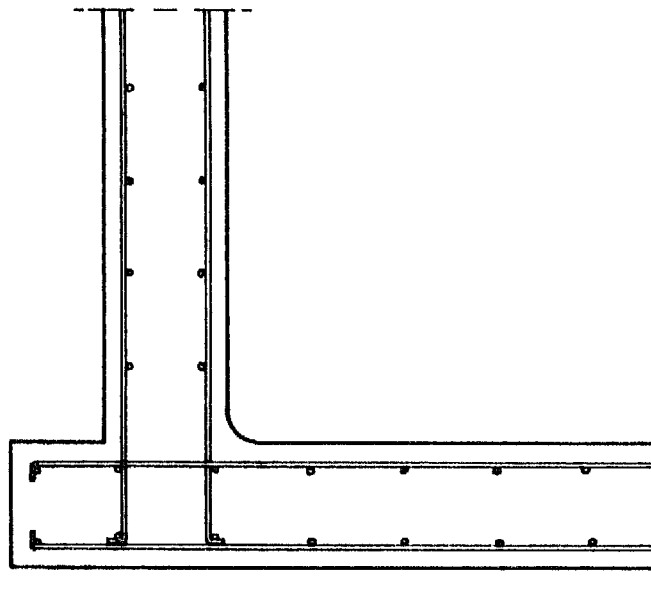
Example of a reinforcement design for a wall-floor connection
